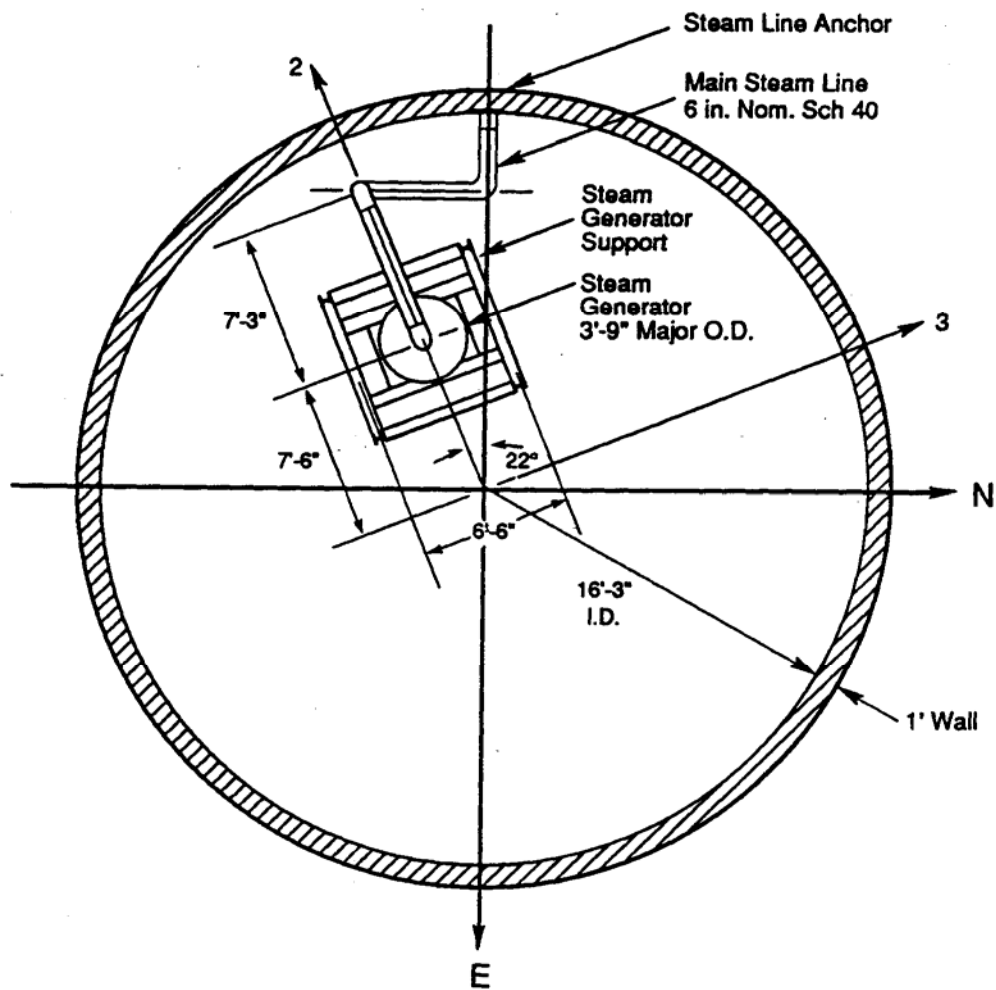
Horizontal Cross-Section of the 1/4-Scale Containment Model
